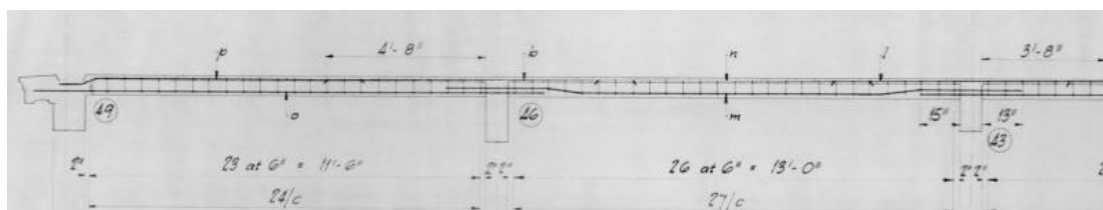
Typical Reinforcement Detailing of Ribbed Slabs. Note Continuous Reinforcement Through Beams
